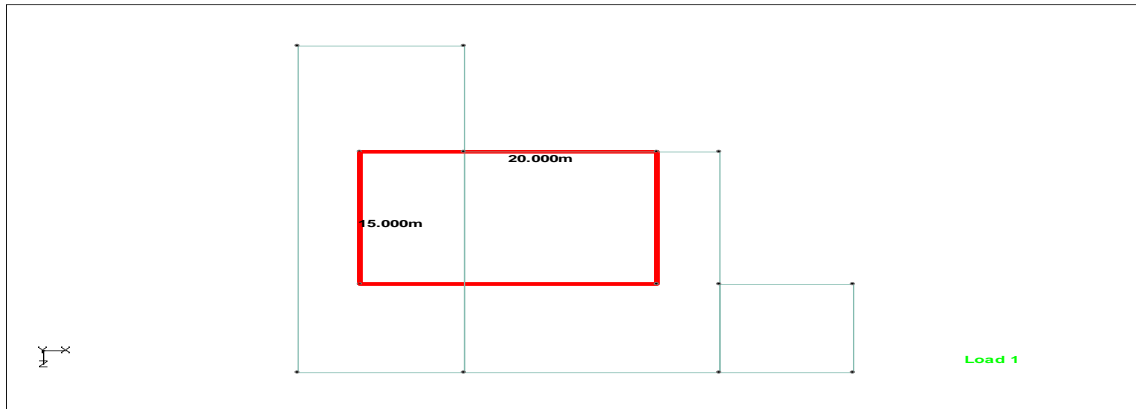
Layout plan of Model Frame 2 (Swimming pool near centre position)
